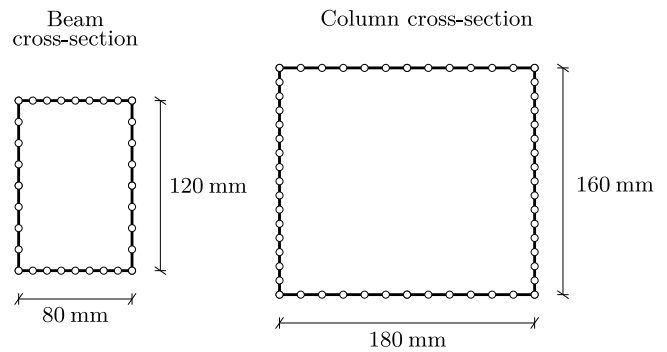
Ex. 2 - Discretisation of beam and column cross-sections.
